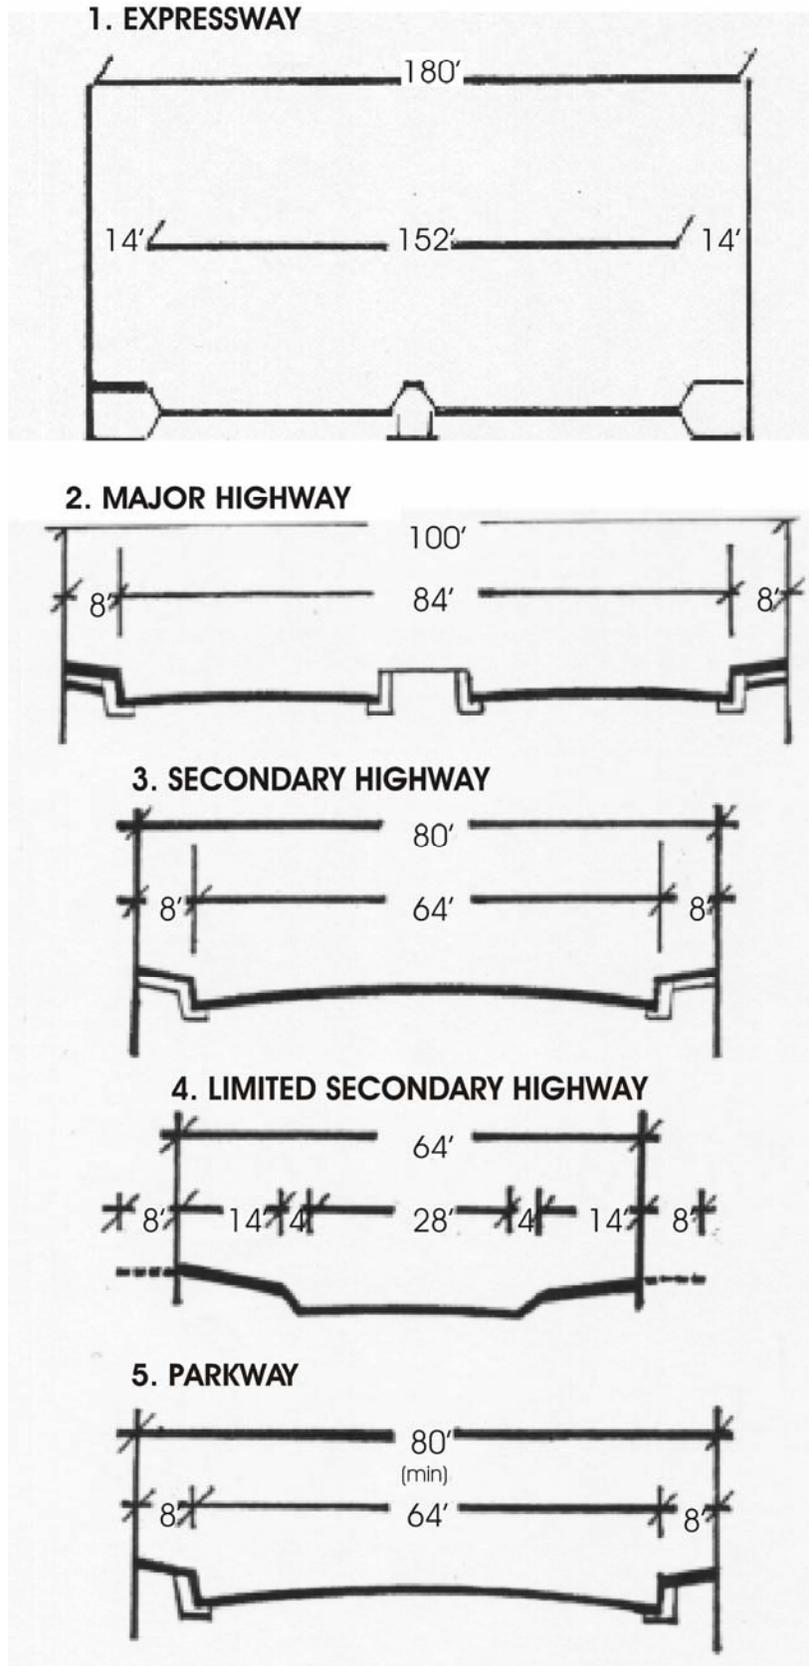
H: CITY OF Irwindale General Plan Roadway Cross-Sections
